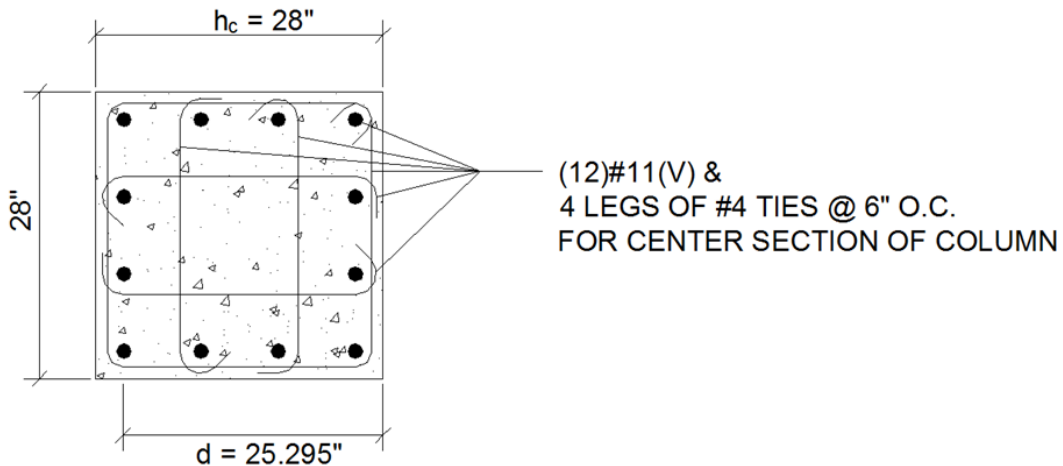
Exterior column, cross-section at center section of column at the 2nd floor level based on tsunami design requirements.
